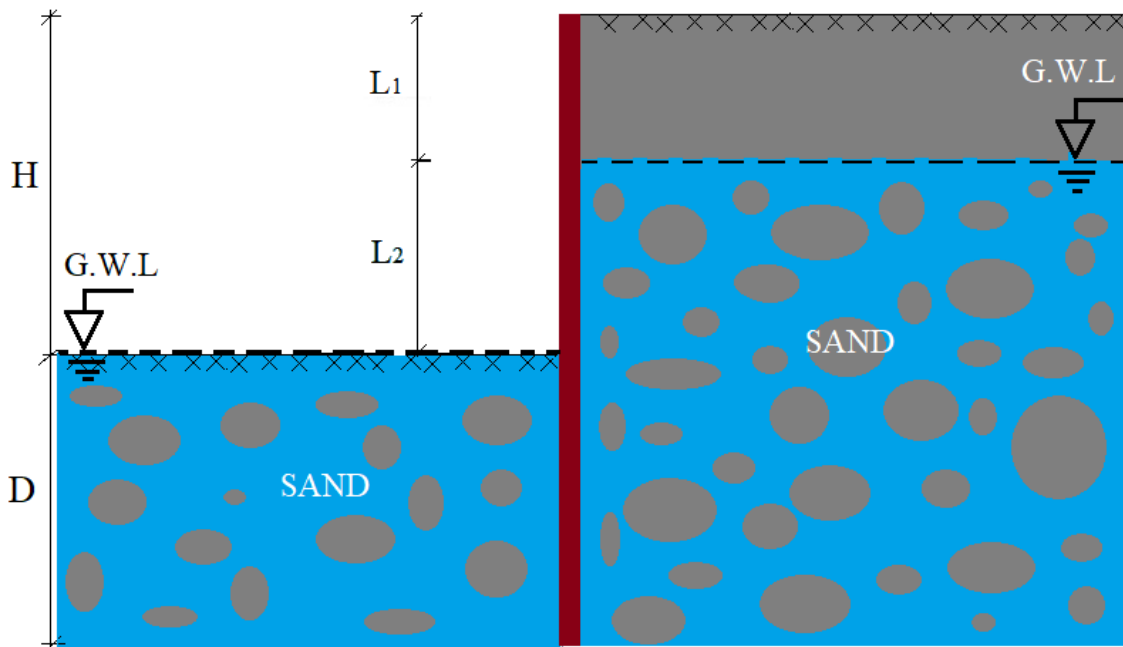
The Soil Profile and Cantilever Sheet Pile Wall Model
